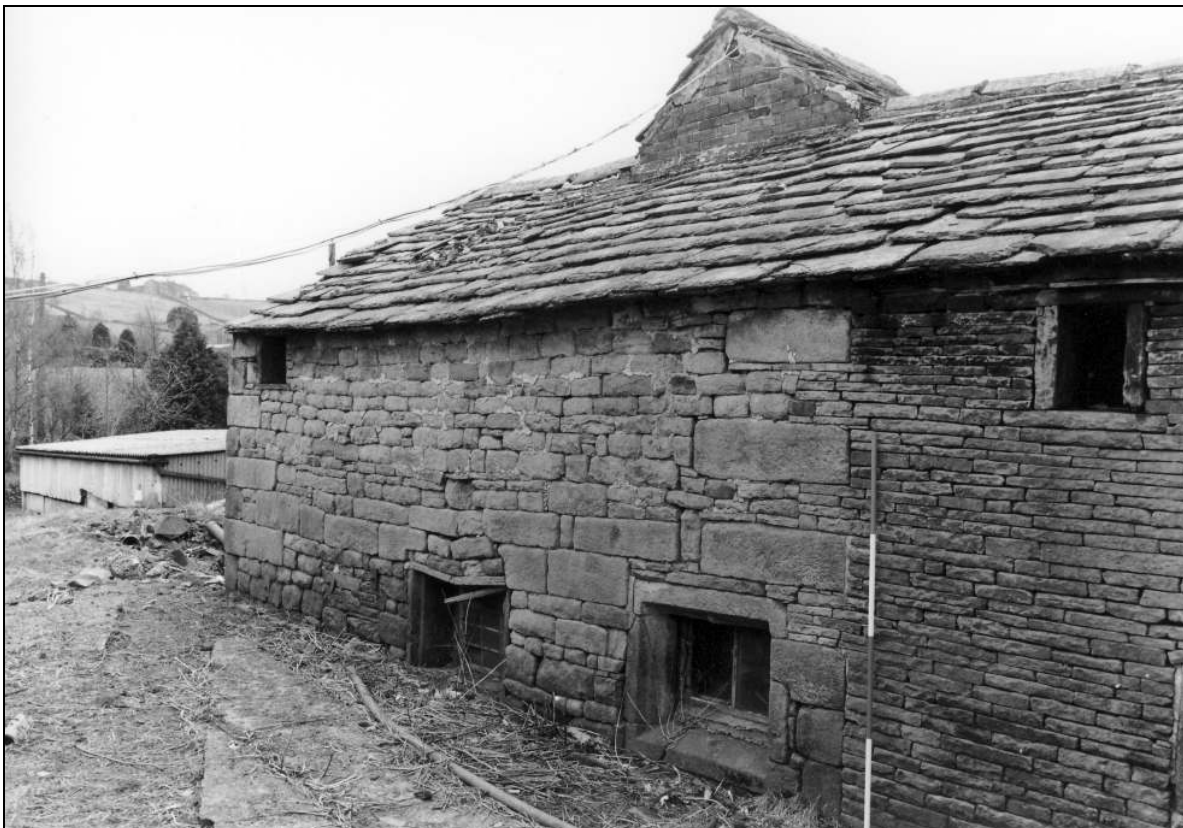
Early wing: north-east elevation (film 1, frame 8)
